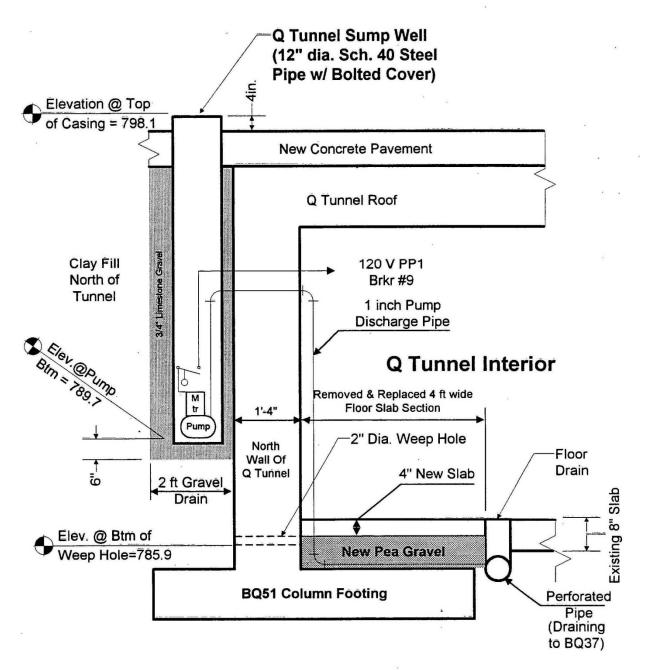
Figure QSWE--Q Tunnel Sump Well Elevation Detail
